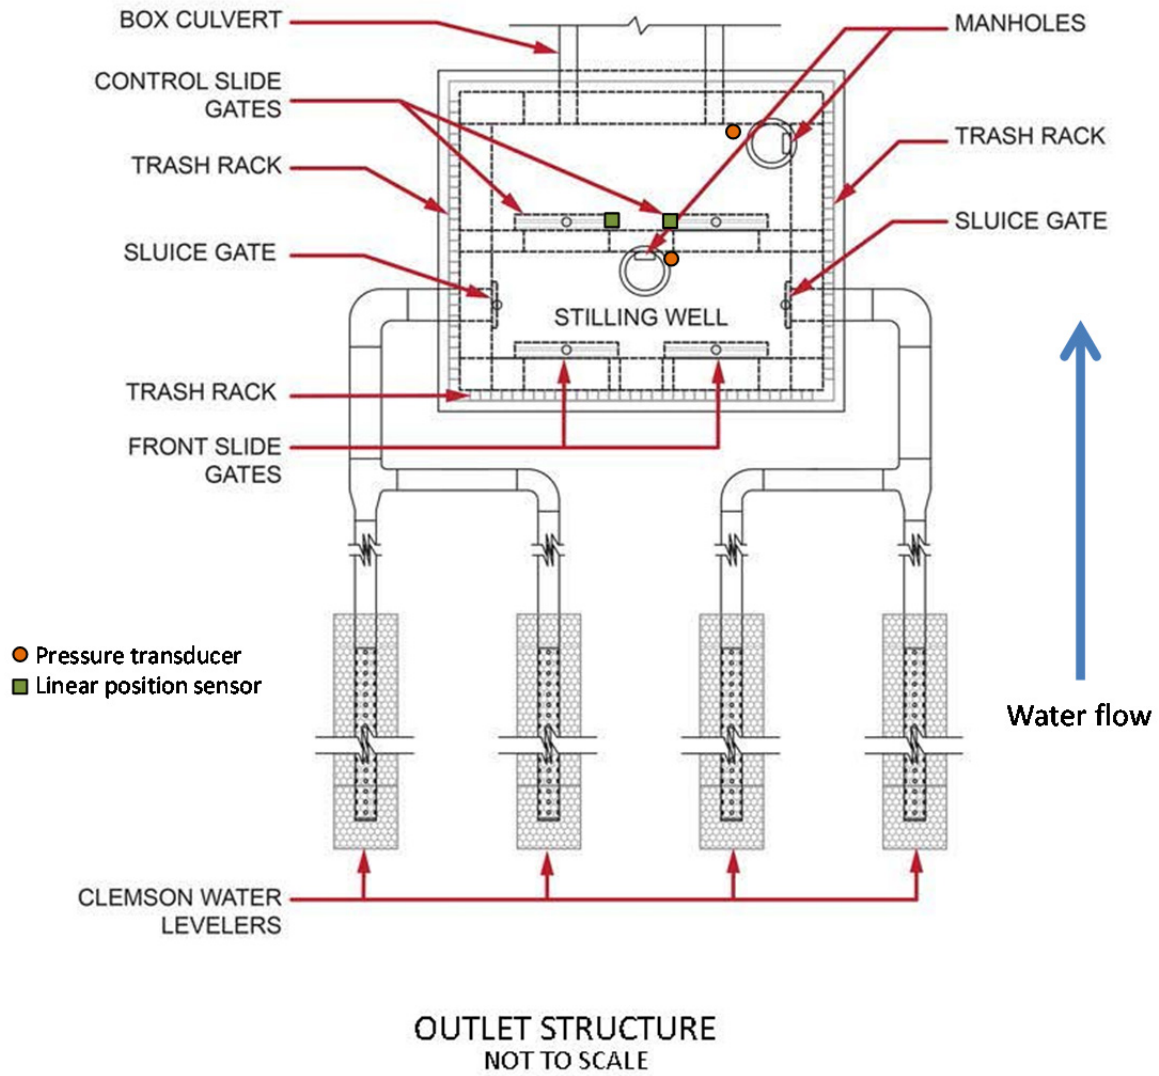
Plan view of Huntley Meadows pond outlet control structure (schematic courtesy of WSSI).
